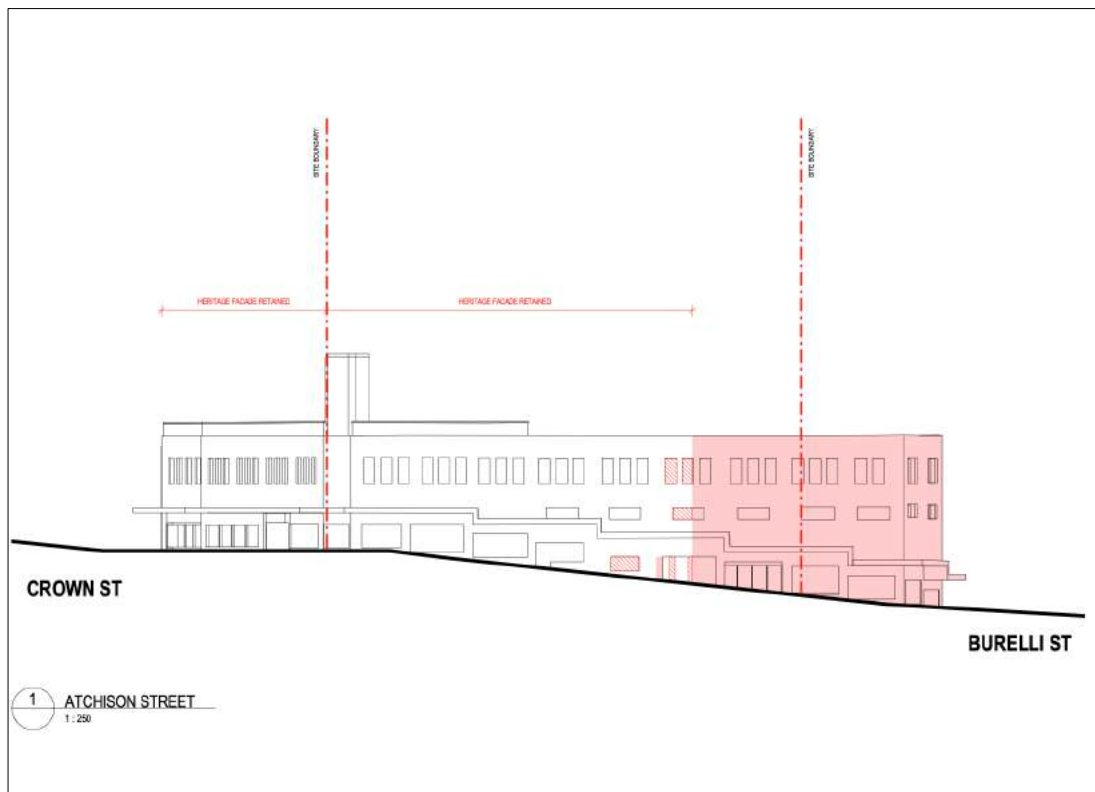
(b): Identifying the extent of the area of conservation works: Atchison Street elevation.
